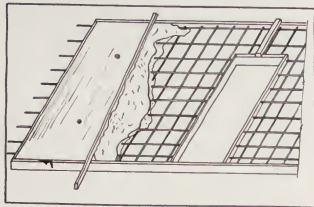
Partial wall panel section showing reinforcement, door frame, panel lifting bolts and dowel extensions.
